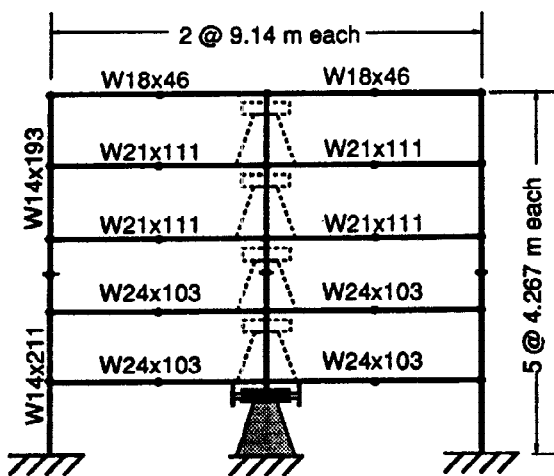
Example structure with nonlinear TSW beam-column connections and active bracing between each floor.
